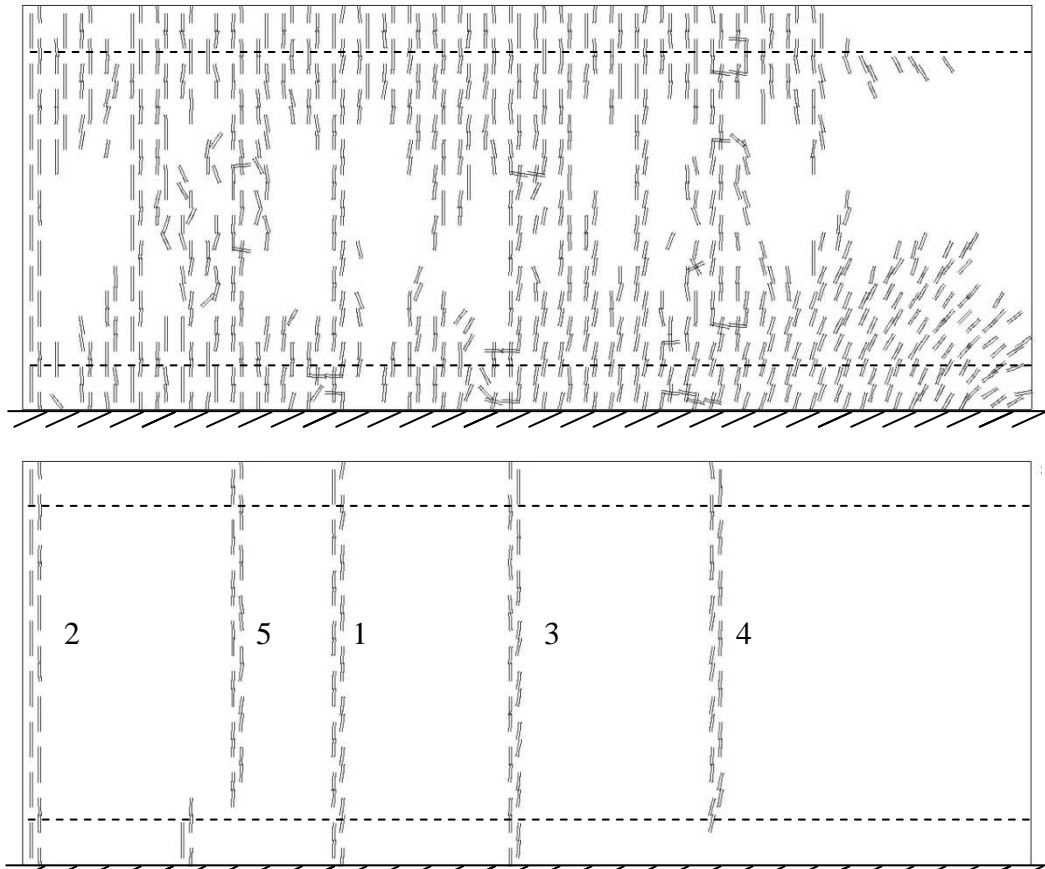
Crack pattern at  $\varepsilon_{cs} = 1 \text{ ‰}$  for 0 and 100 % fully developed cracks for fibre reinforced concrete with cross-section 1.
